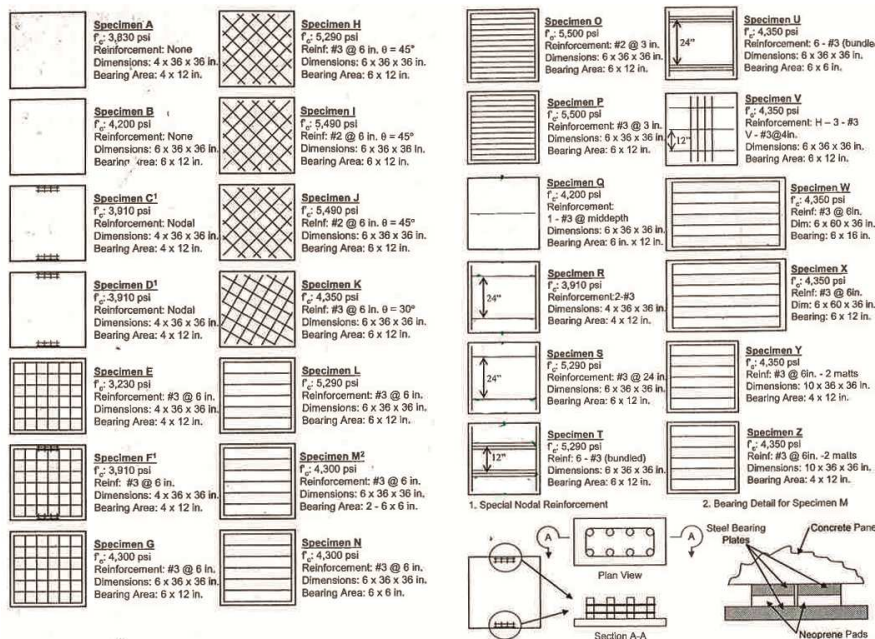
Reinforcement layouts for isolated strut specimens (1 in. = 25.4 mm; 1000 psi = 6.9 MPa).
